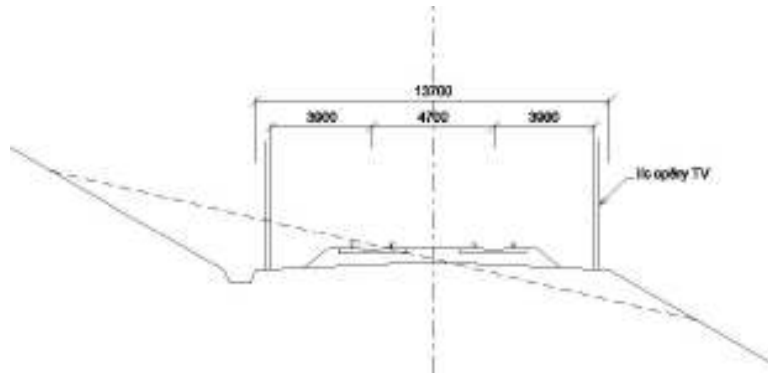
Spatial layout of the high speed railway superstructure [1]
